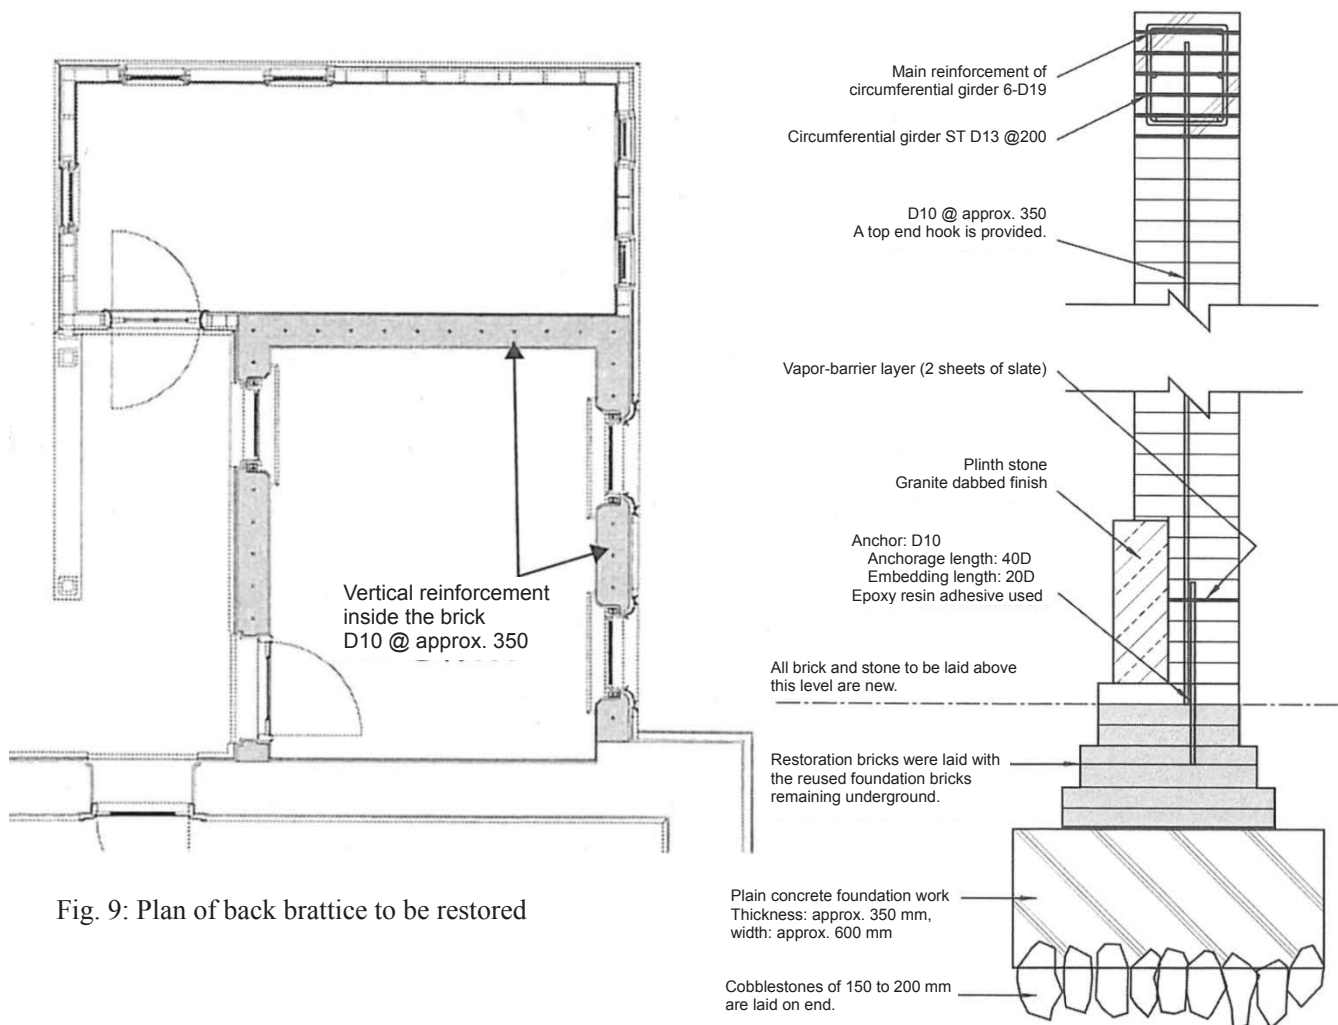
Detailed cross-sectional drawing of brick wall of back brattice to be restored
